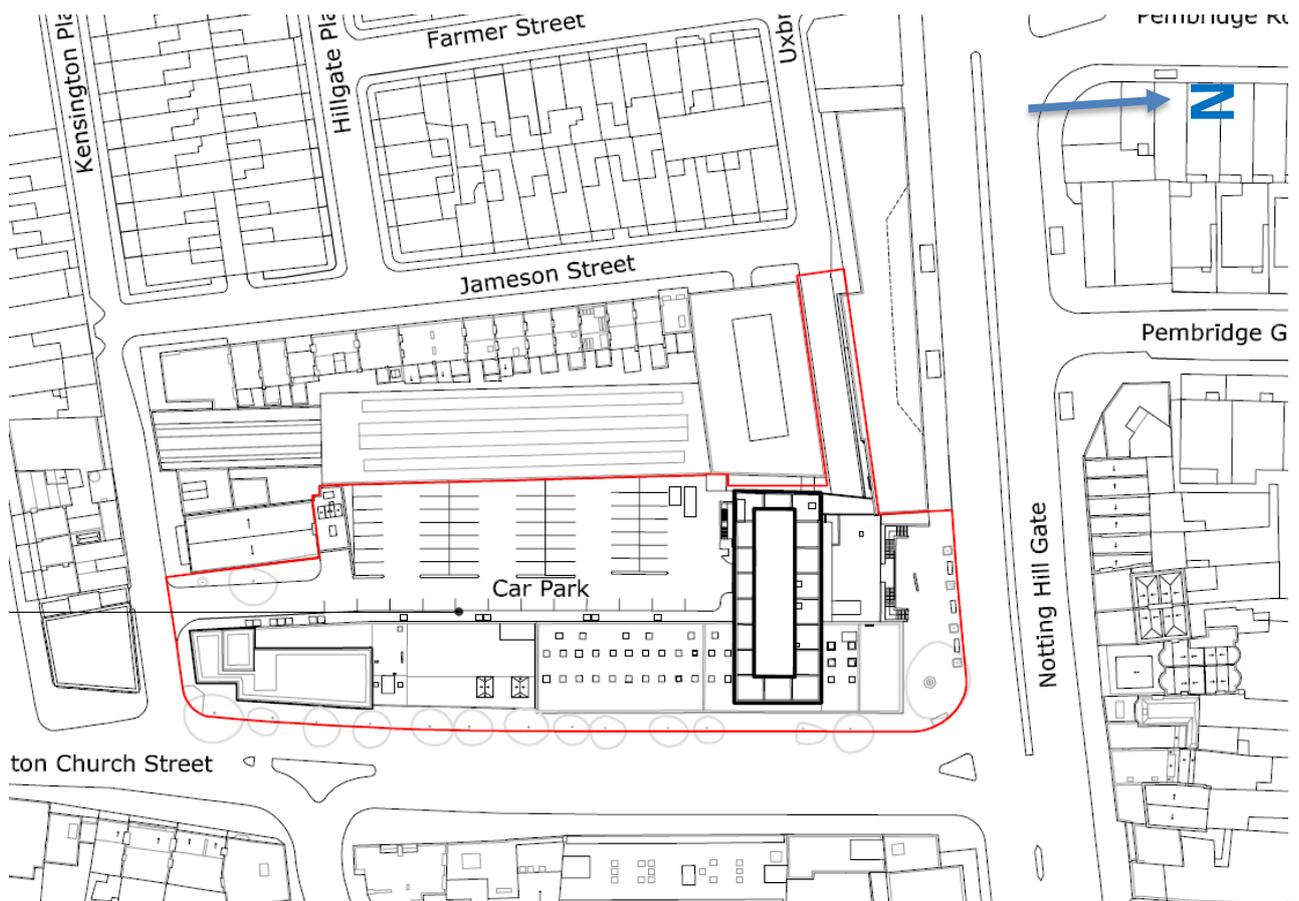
Existing location plan (1659 P-SITE-XX (0-)-001)
